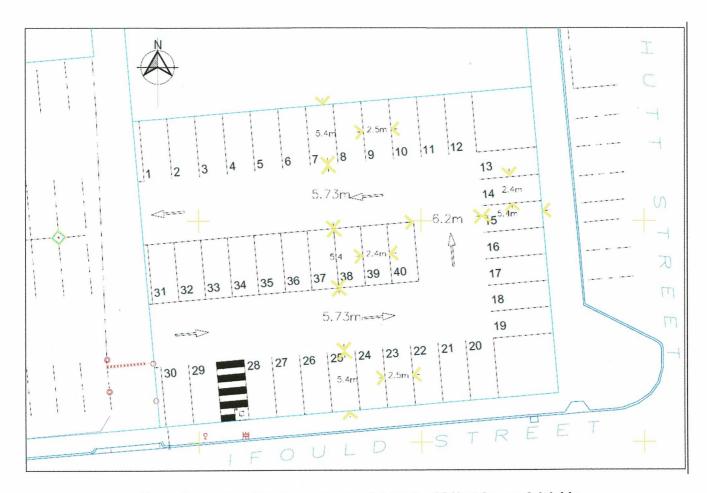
proposed temporary car park layout - 55 Hutt Street, Adelaide
